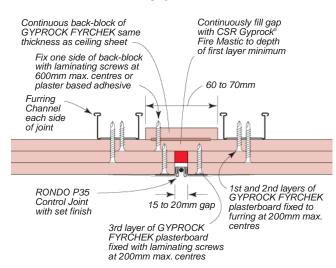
CONTROL JOINT PERPENDICULAR TO STEEL FRAMING – 3 LAYERS
